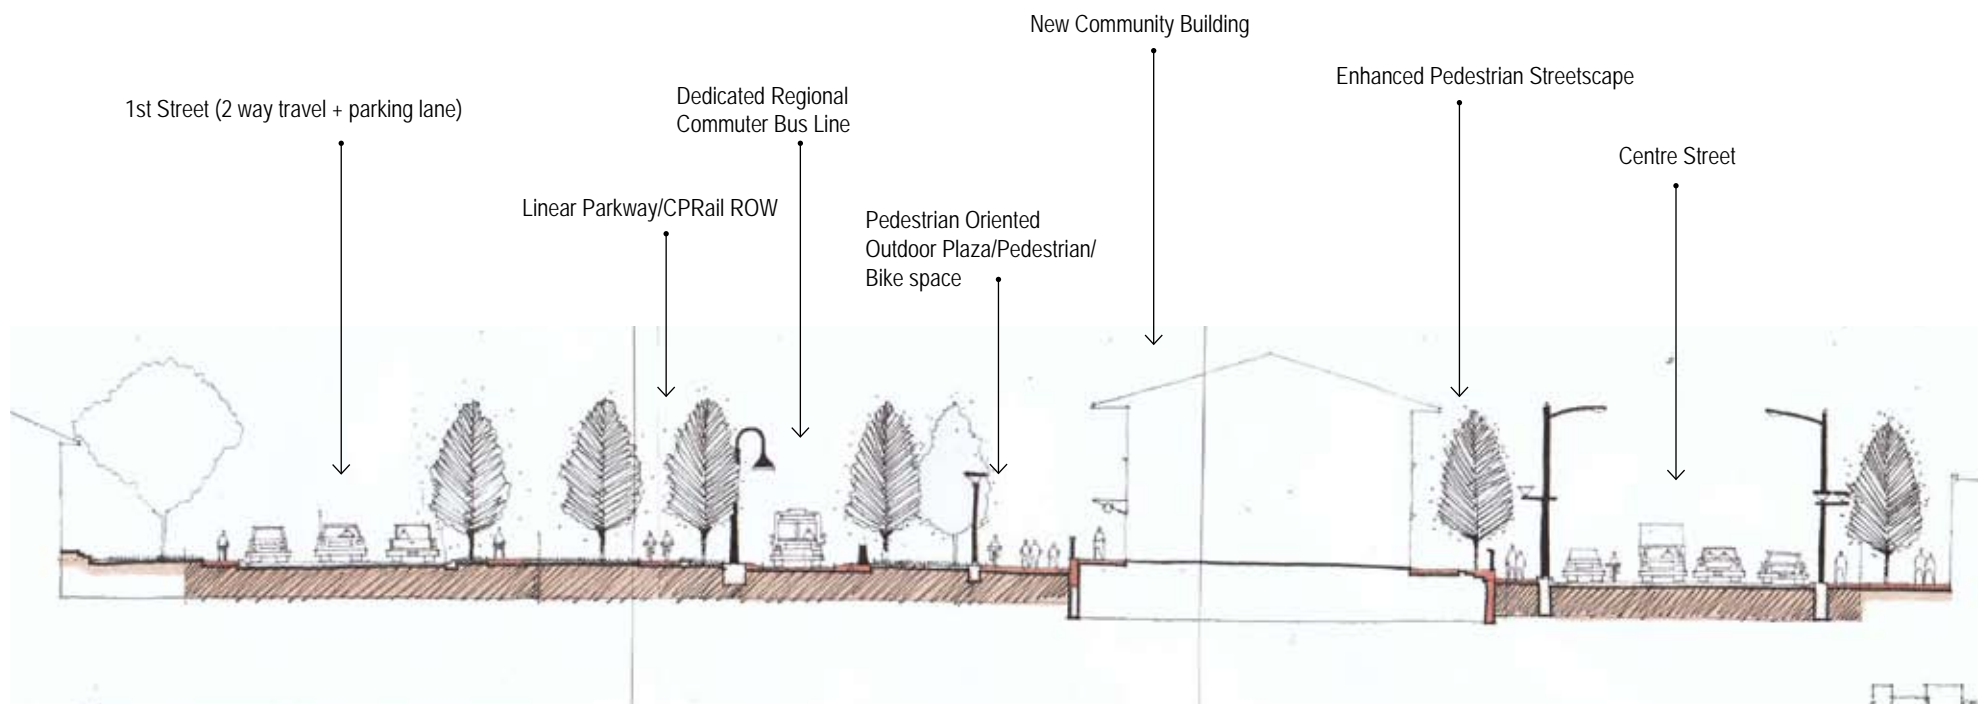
Typical Cross Section between 1st Street, Railway Corridor and Centre Street on the right
